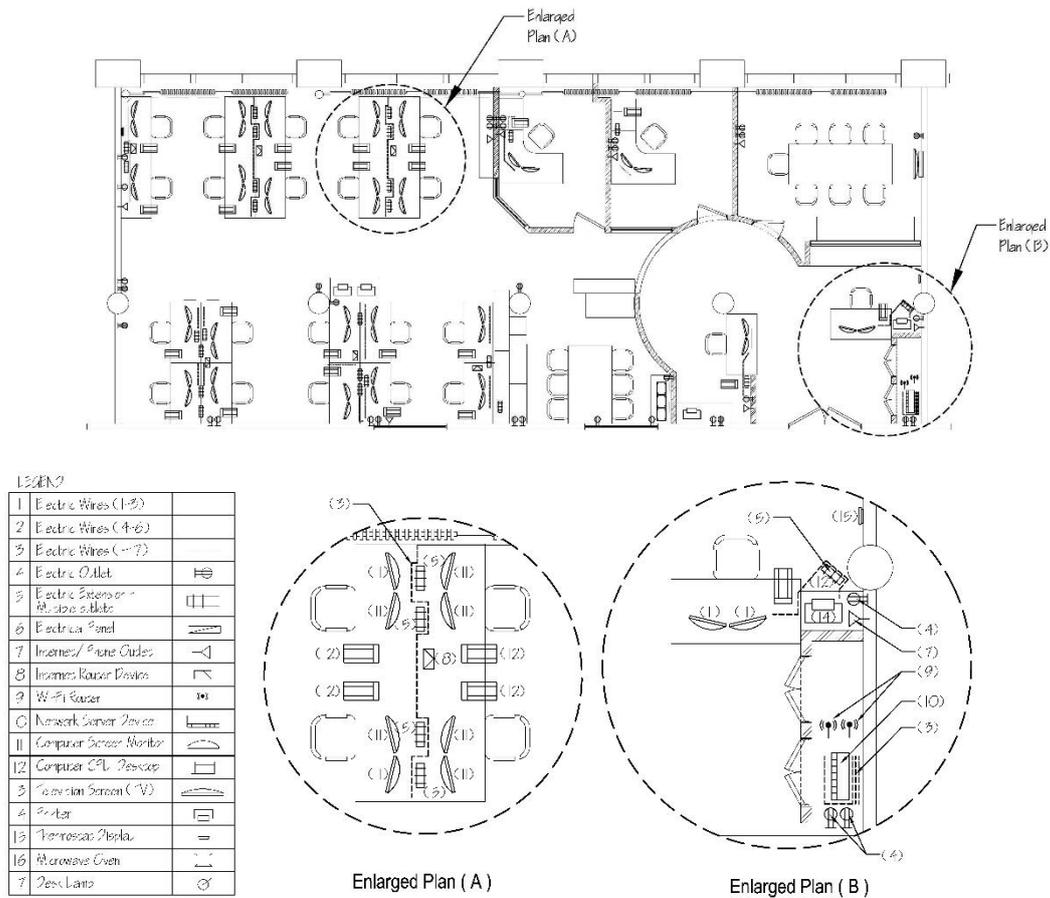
The space floor plan showing sources & devices emanating EMF/R.
